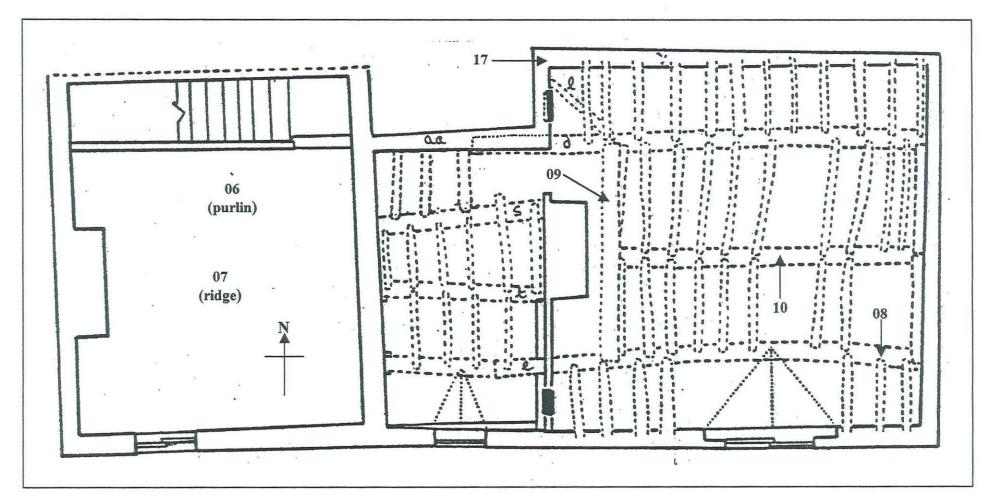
Plan at first-floor level to show timbers sampled (not all sampled timbers shown)
